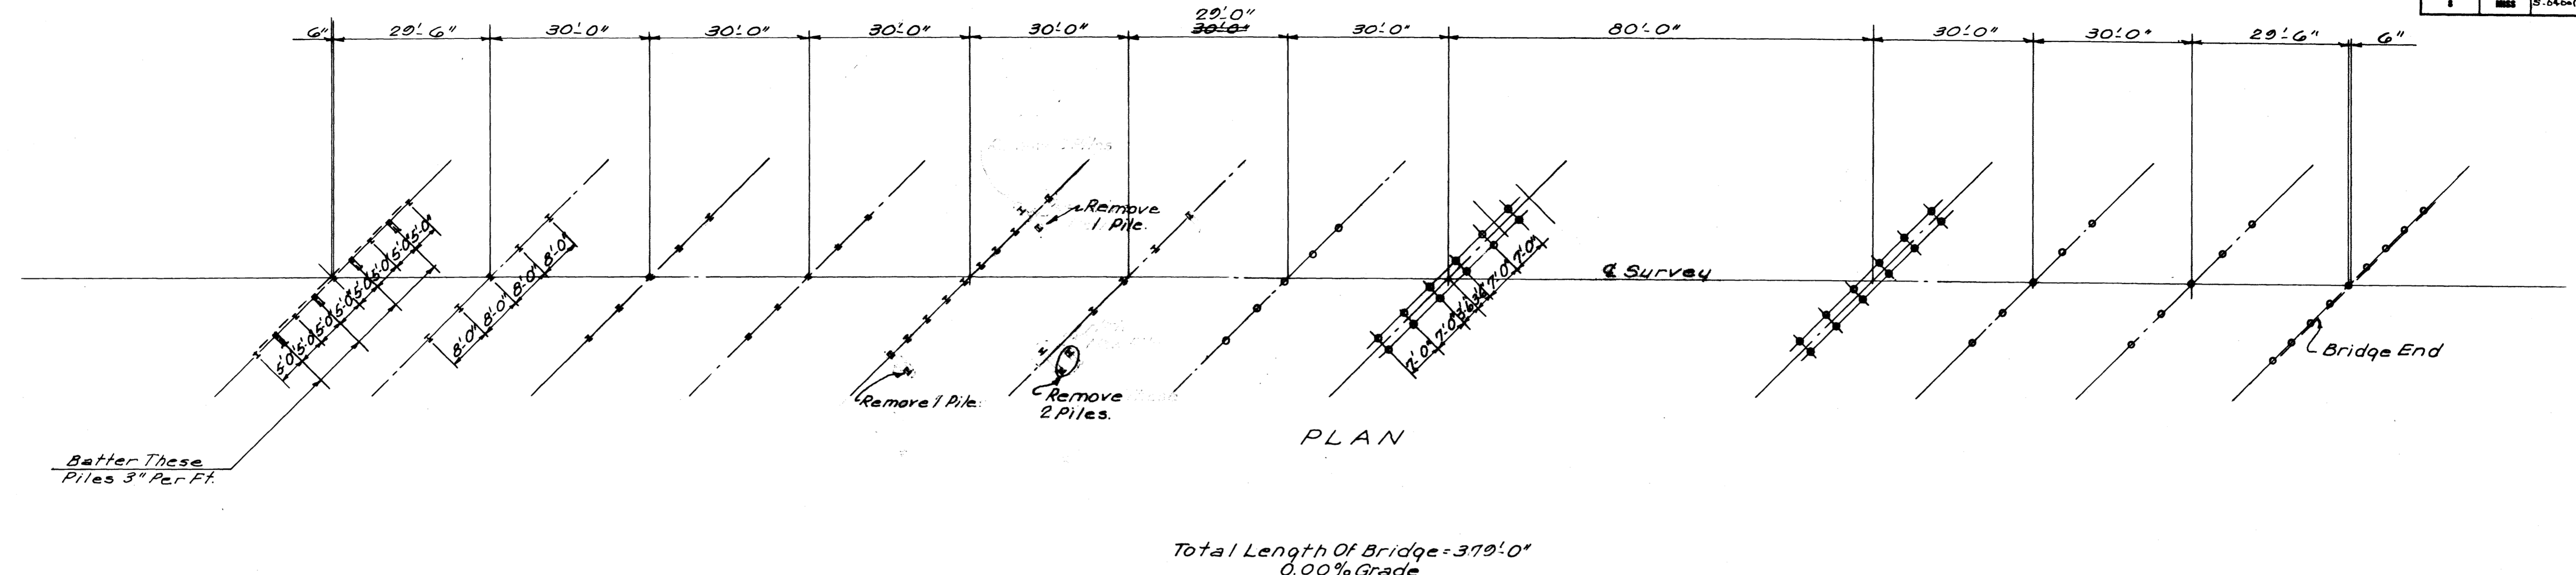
PLAN - PROFILE O.P.R. & N.E. STANDARD
